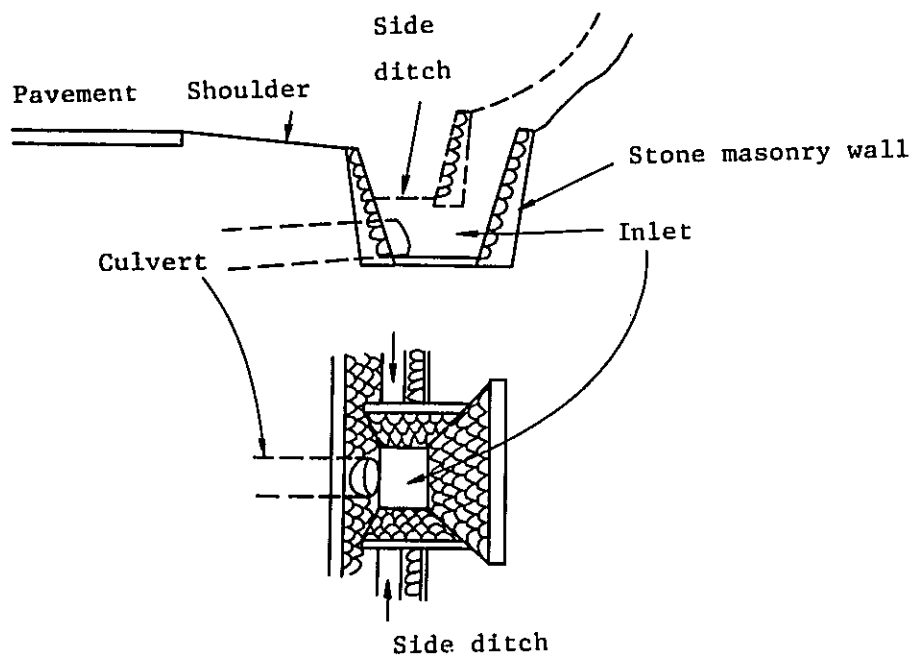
Inlet Protected by Stone Masonry Wall
